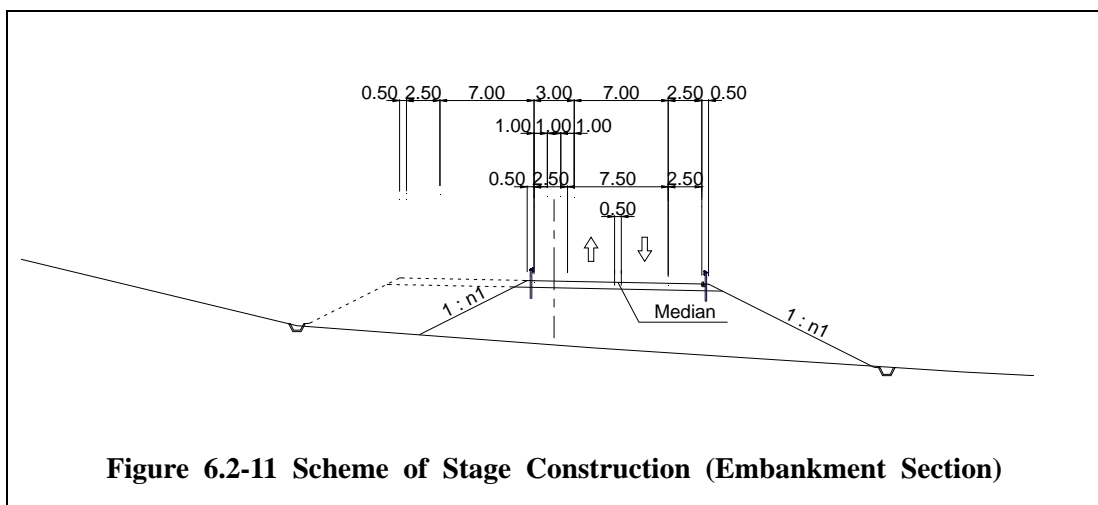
Scheme of Stage Construction (Embankment Section)
